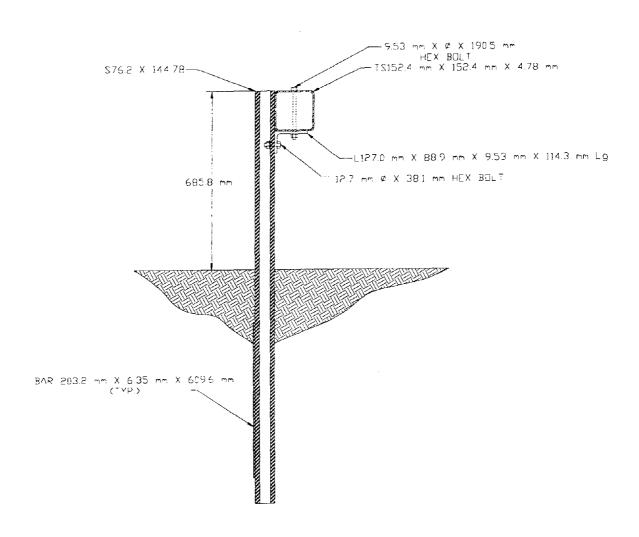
Cross-section of the box-beam (G3) guardrail system.
